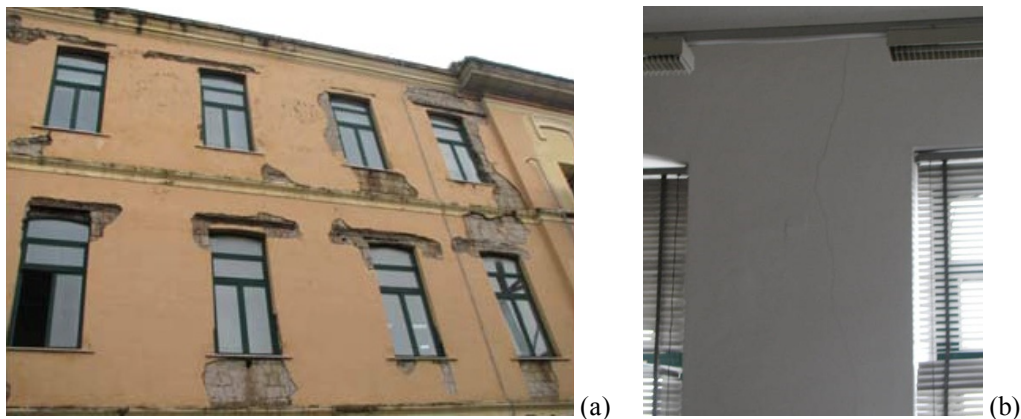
Presence of cracks on the external (a) and internal (b) walls of the school Mazza
